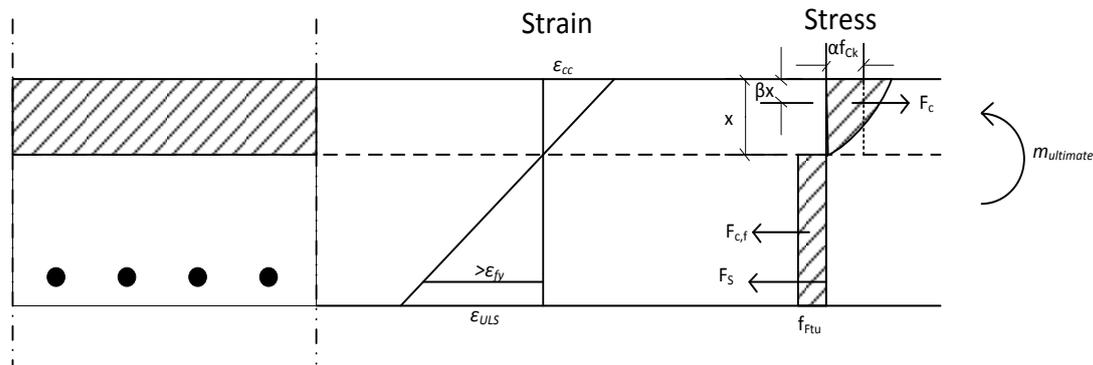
Cross section when ultimate strain for steel fibre reinforced concrete was reached in bottom fibre.
